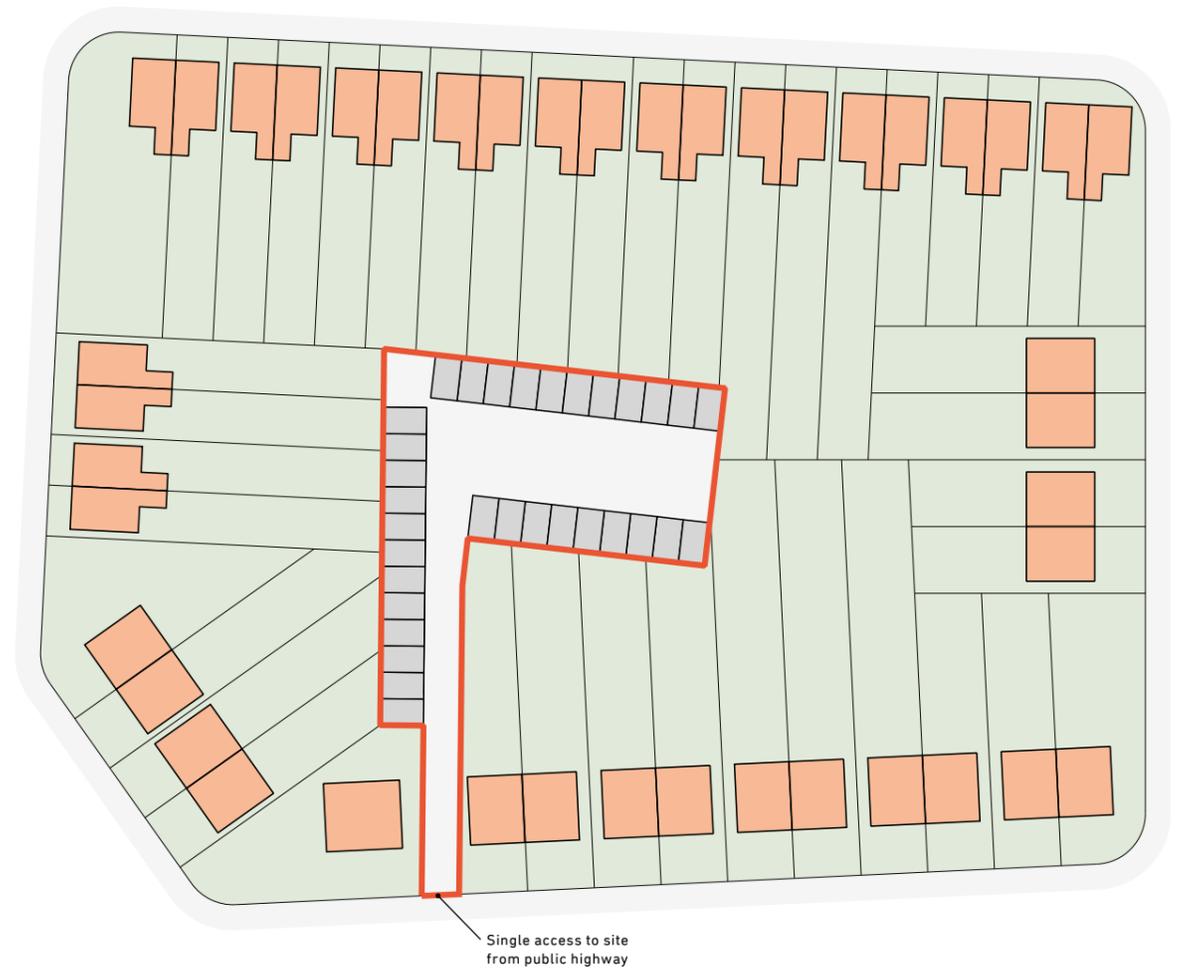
Plan showing typical garage site at the rear of suburban block. Here a single narrow route from the public highway provides access to garages at the rear of existing properties.
